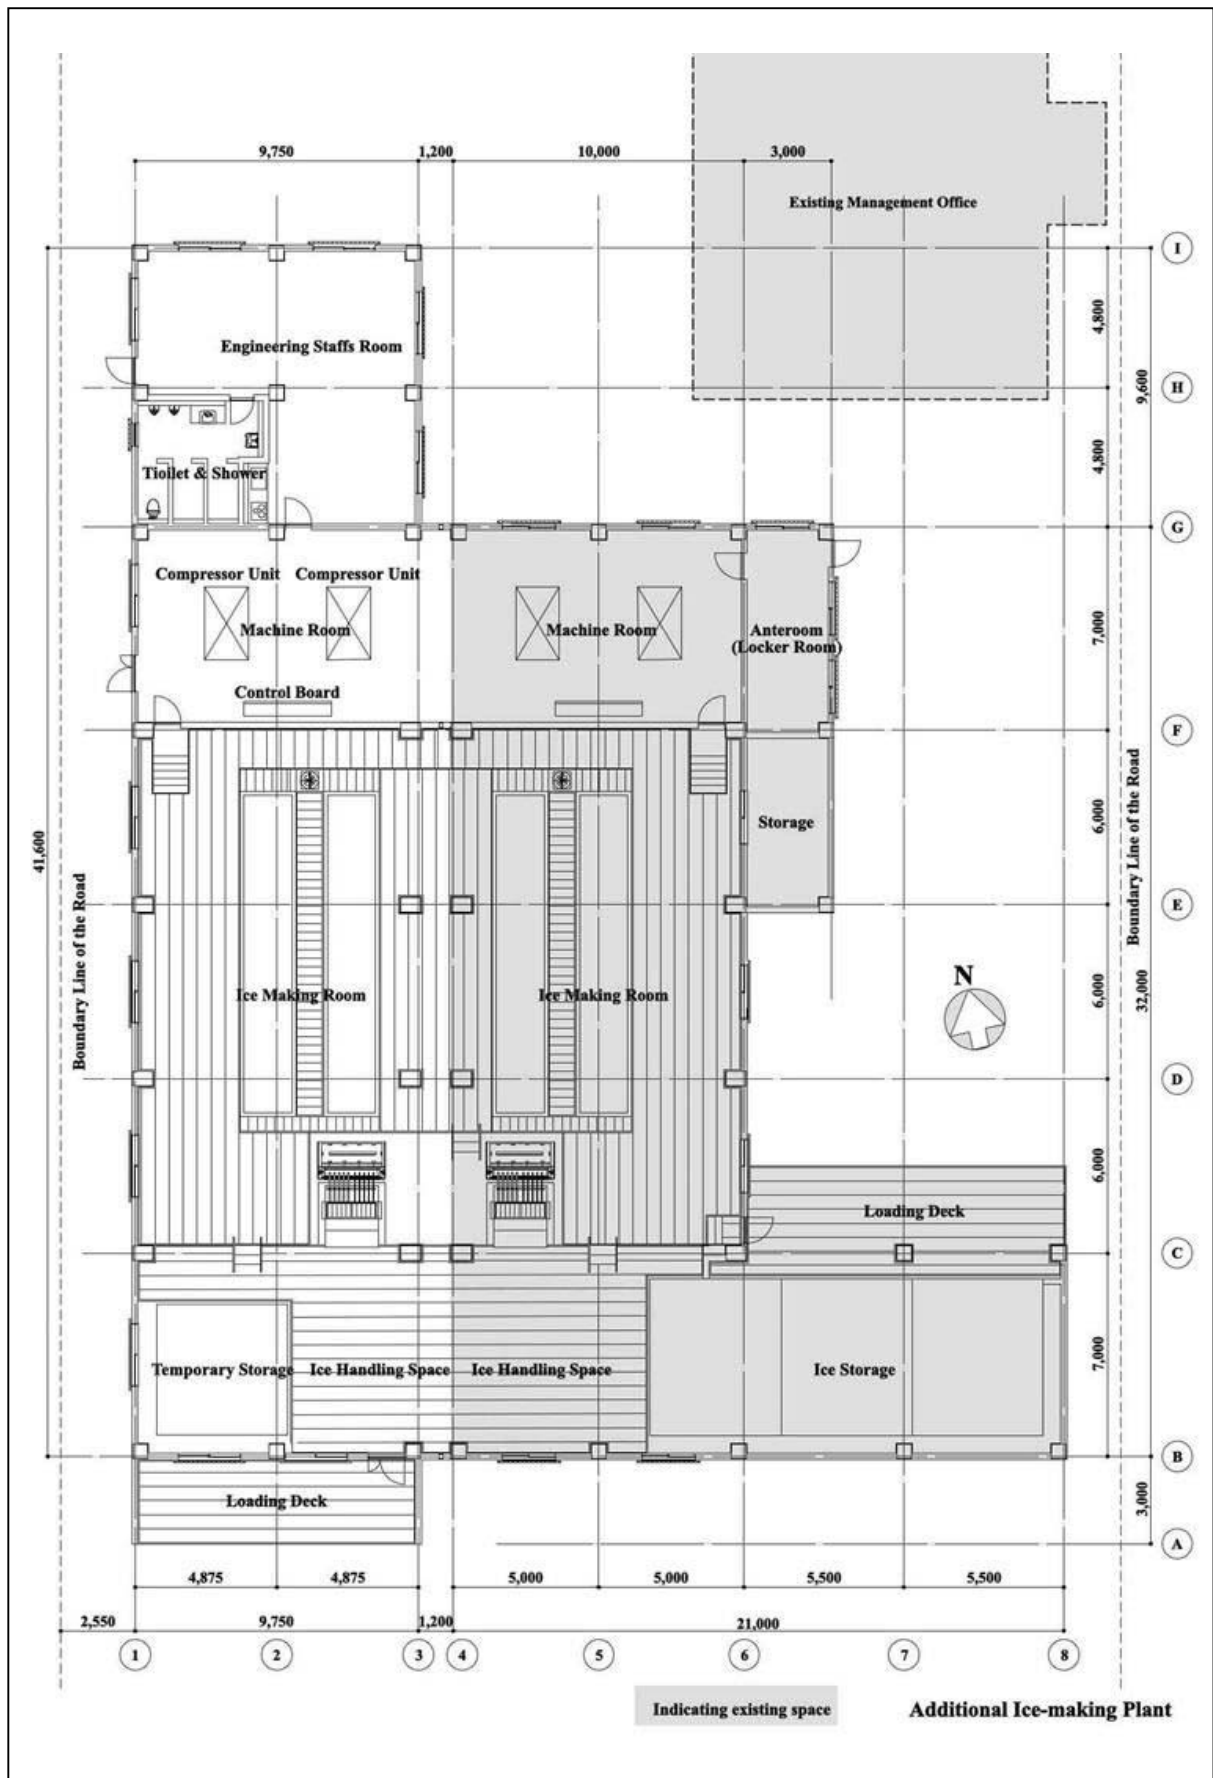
(7) Layout Plan of Ice Plant
